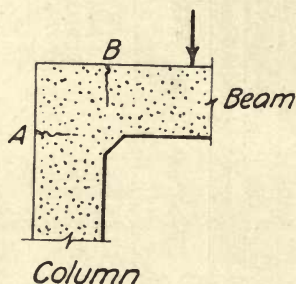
CONNECTION OF BEAM AND COLUMN SHOWING TYPICAL LOCATION OF FIRST CRACKS
